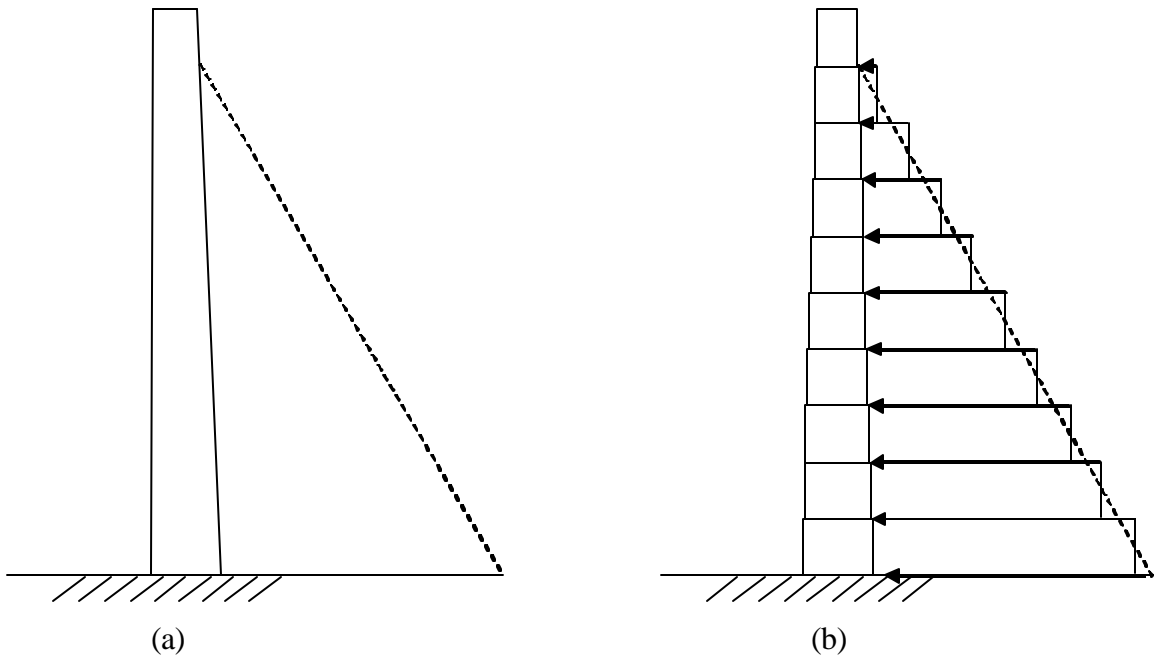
(a) Theoretical loading on retaining wall. (b) Approximated cross-section of retaining wall with piecewise constant distributed load.
